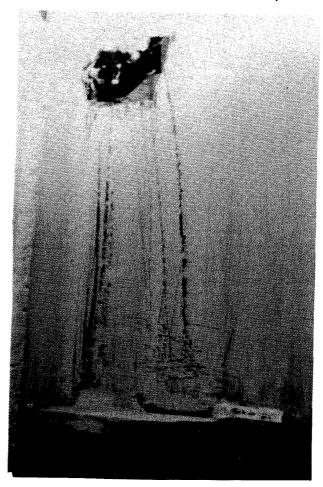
Signs of Local Yielding, Evidenced by Whitewash Flaking in Web of Stub Specimen IV
